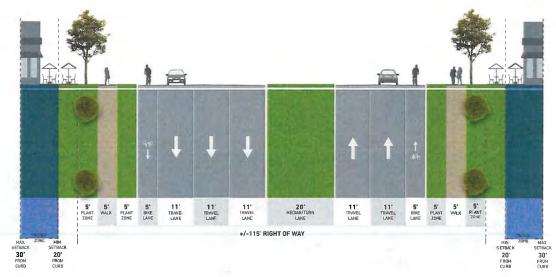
Typical Section (I-270 to Murray Hill Road) on West Broad Street in the Commercial Gateway Sub-District
